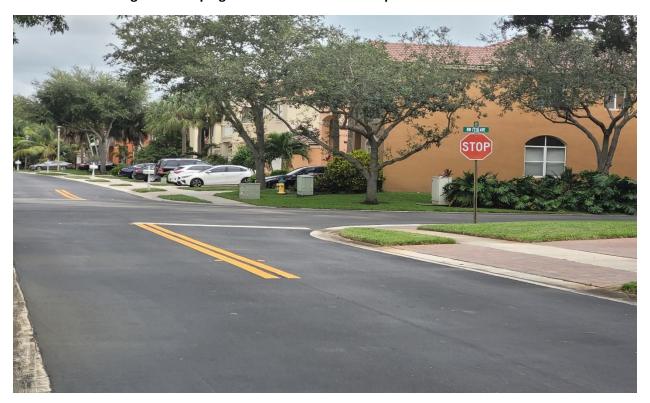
Sealcoating and restriping of internal WCCDD roads performed in 2022.
